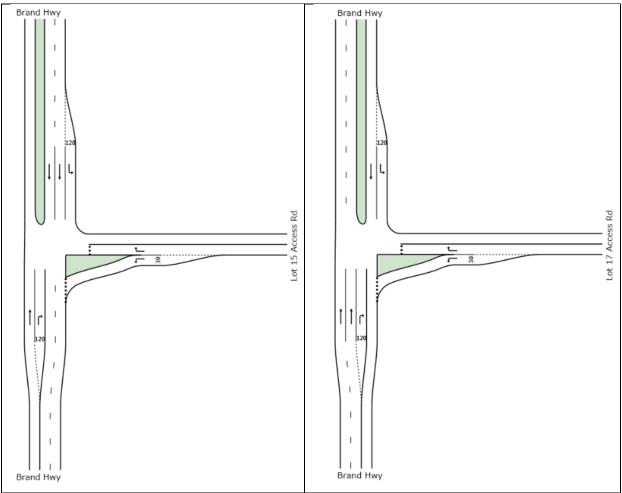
Proposed Intersection Layouts, Brand Hwy/Access Roads for Lots 15&17
